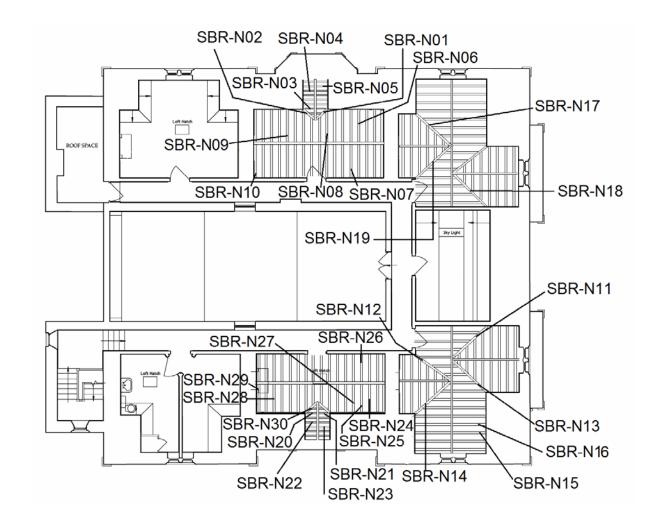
Second-floor plan, showing the location of samples SBR-N01-30 (Blackett-Ord Conservation))
